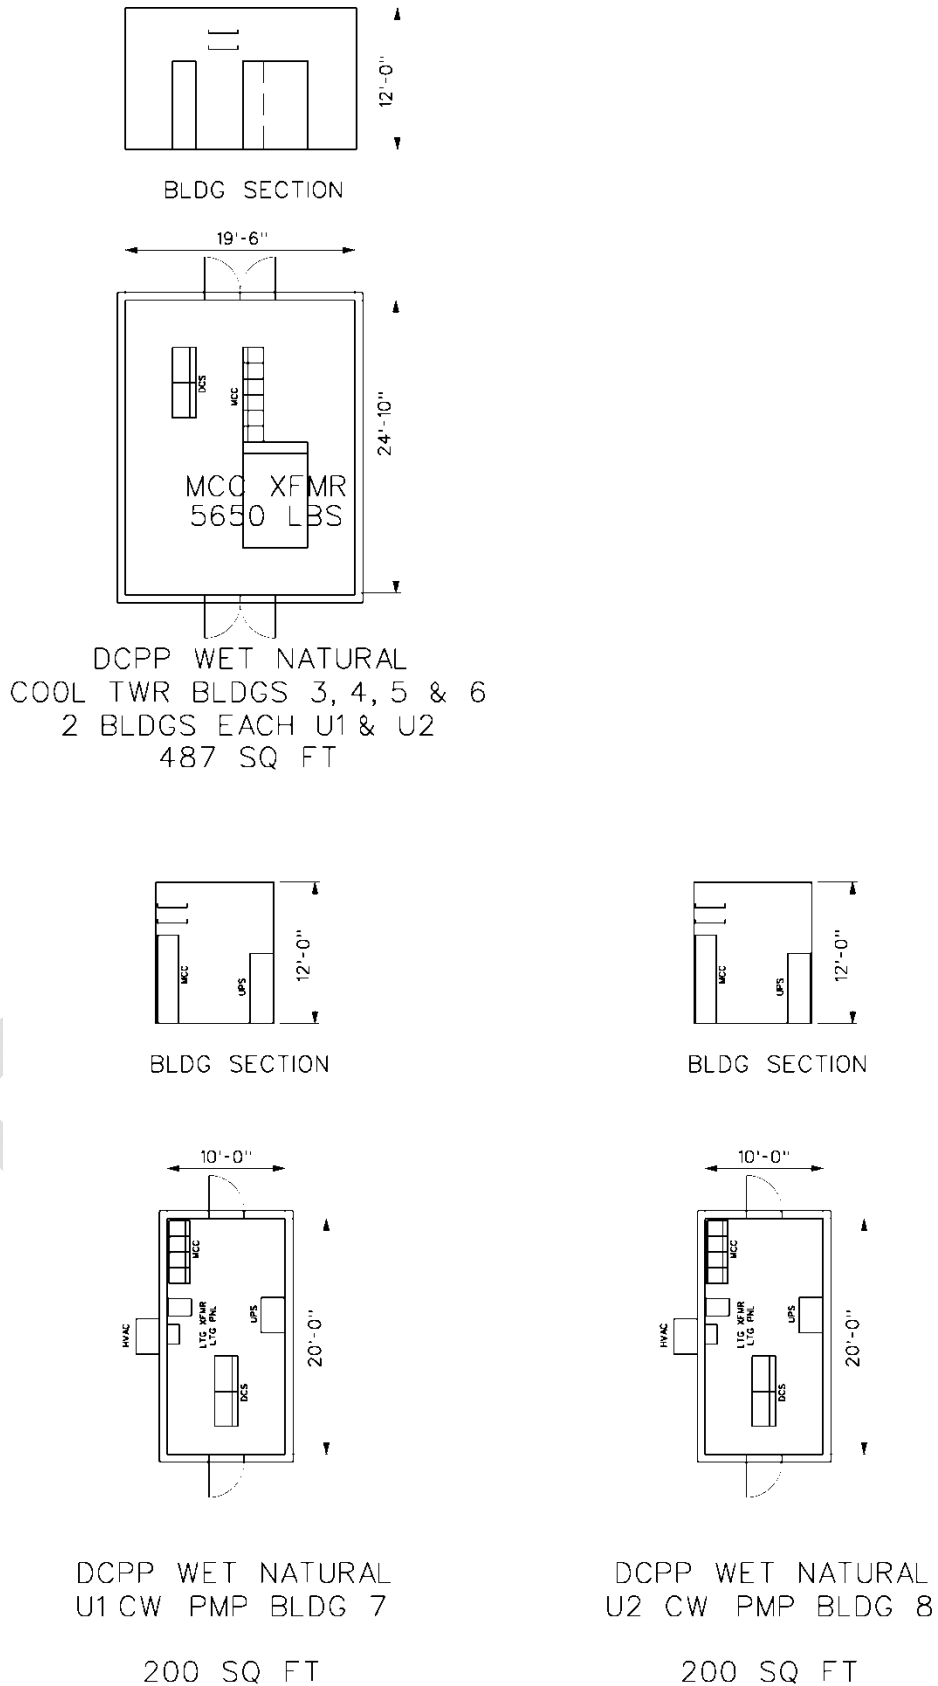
Wet Natural Draft Cooling—Cooling Tower and Pumphouse Electrical Buildings
